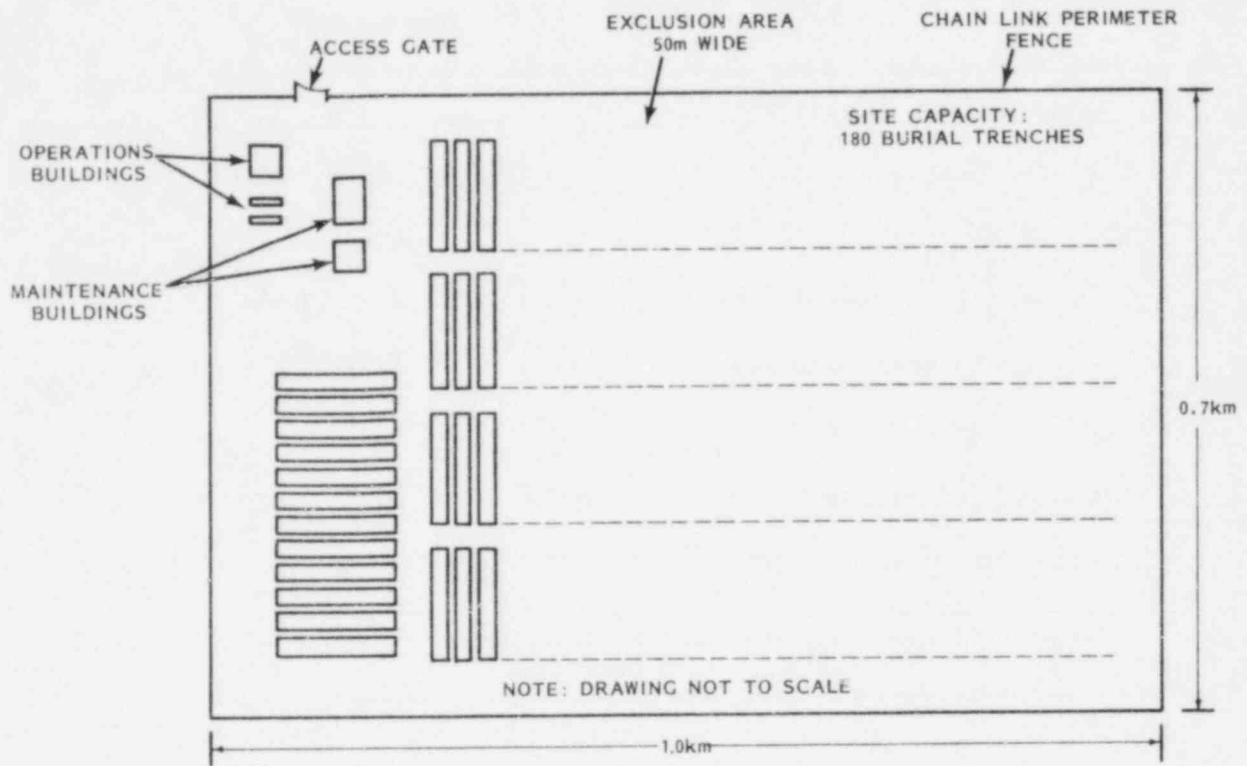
Plot Plan for the Reference Arid Site LLW Burial Ground
